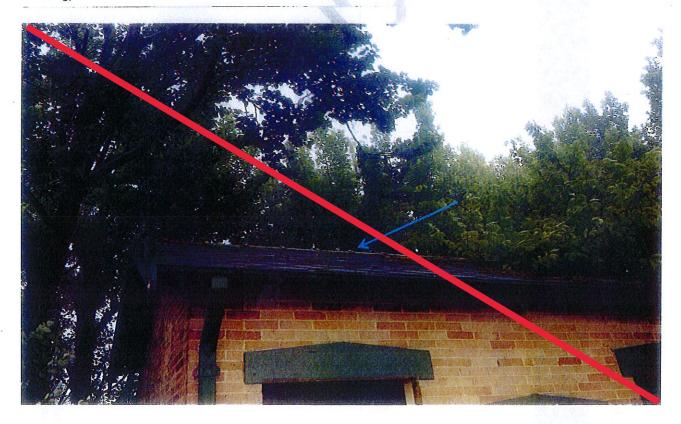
Asbestos cement roof shingles on the roof of Blackheath Shelter Shed (near crossing).
